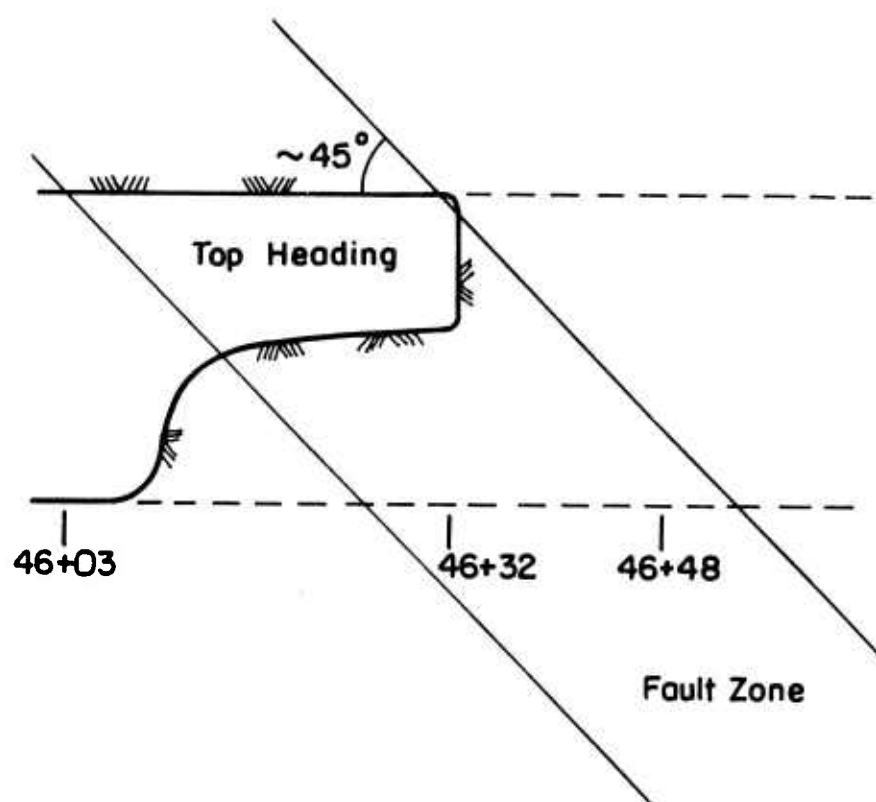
CROSS SECTION OF THE FAULT ZONE AT STATION 46 + 03
